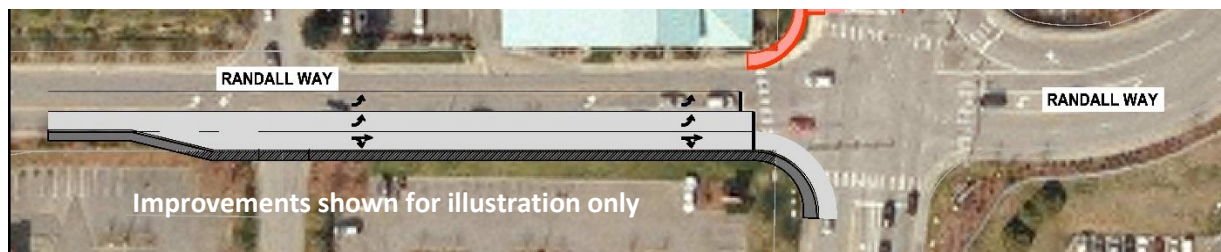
Kitsap Mall Boulevard/Randall Way Intersection Improvements
